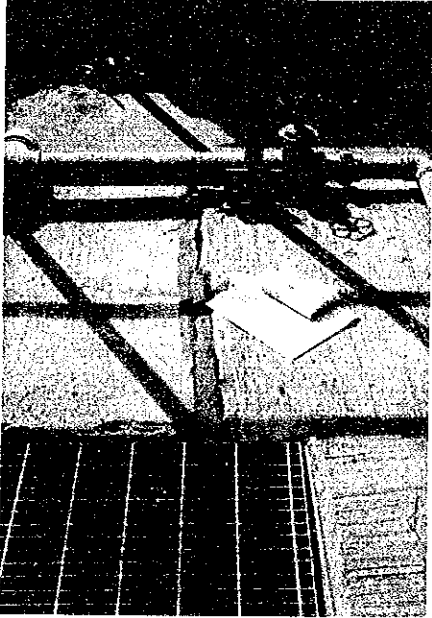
Slipped joint in concrete deck of water reservoir
